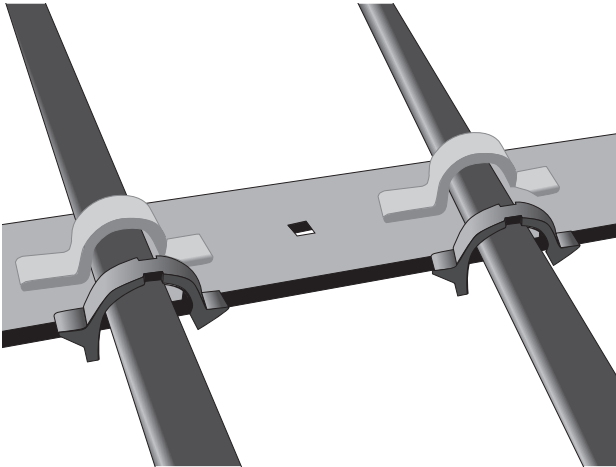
Fastening to foam insulation: Use at least two foam staples to anchor each spacer strip. Staple tubing close to each spacer strip.
